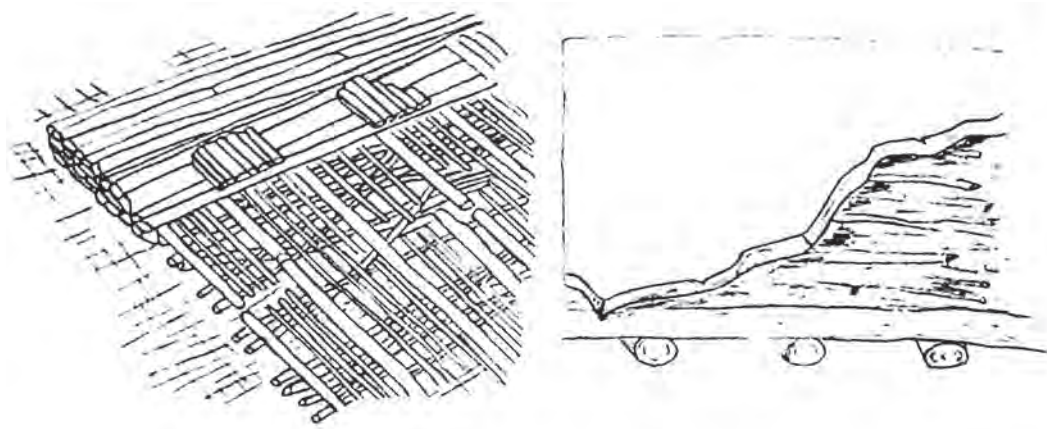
Different kinds of lake-dwelling house floors, (left) multi-layered roundwood floor build directly on the ground; (right) wooden floor paved with clay (from Menotti 2012, 134, Fig. 4.3).
